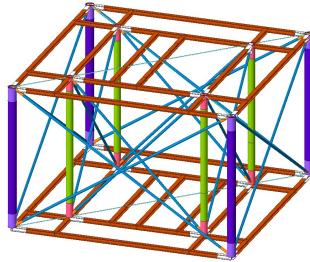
End section in FEM for vertical truss, columns, and beams for typical floor.
